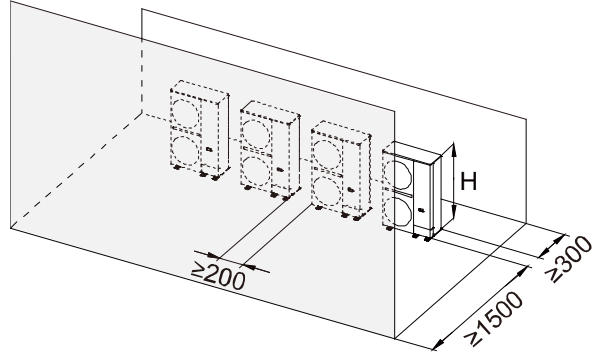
More than one outdoor unit installation (unit: mm)
